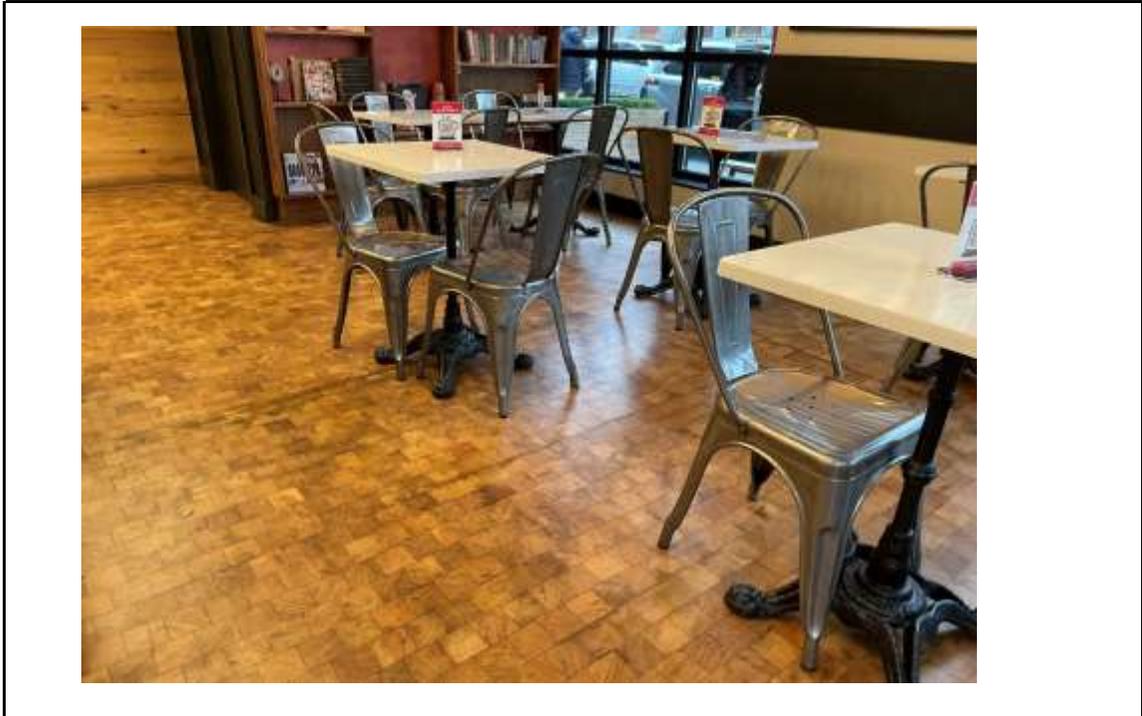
First floor concrete slab covered in tile flooring within the commercial space, facing northwest. 02 March 2023.
